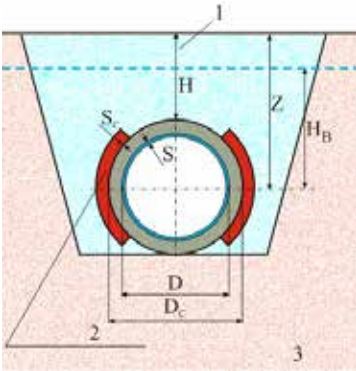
Buried pipe cross-section. 1 - backfill soil, 2 - expansion cushion, 3 - foundation soil
